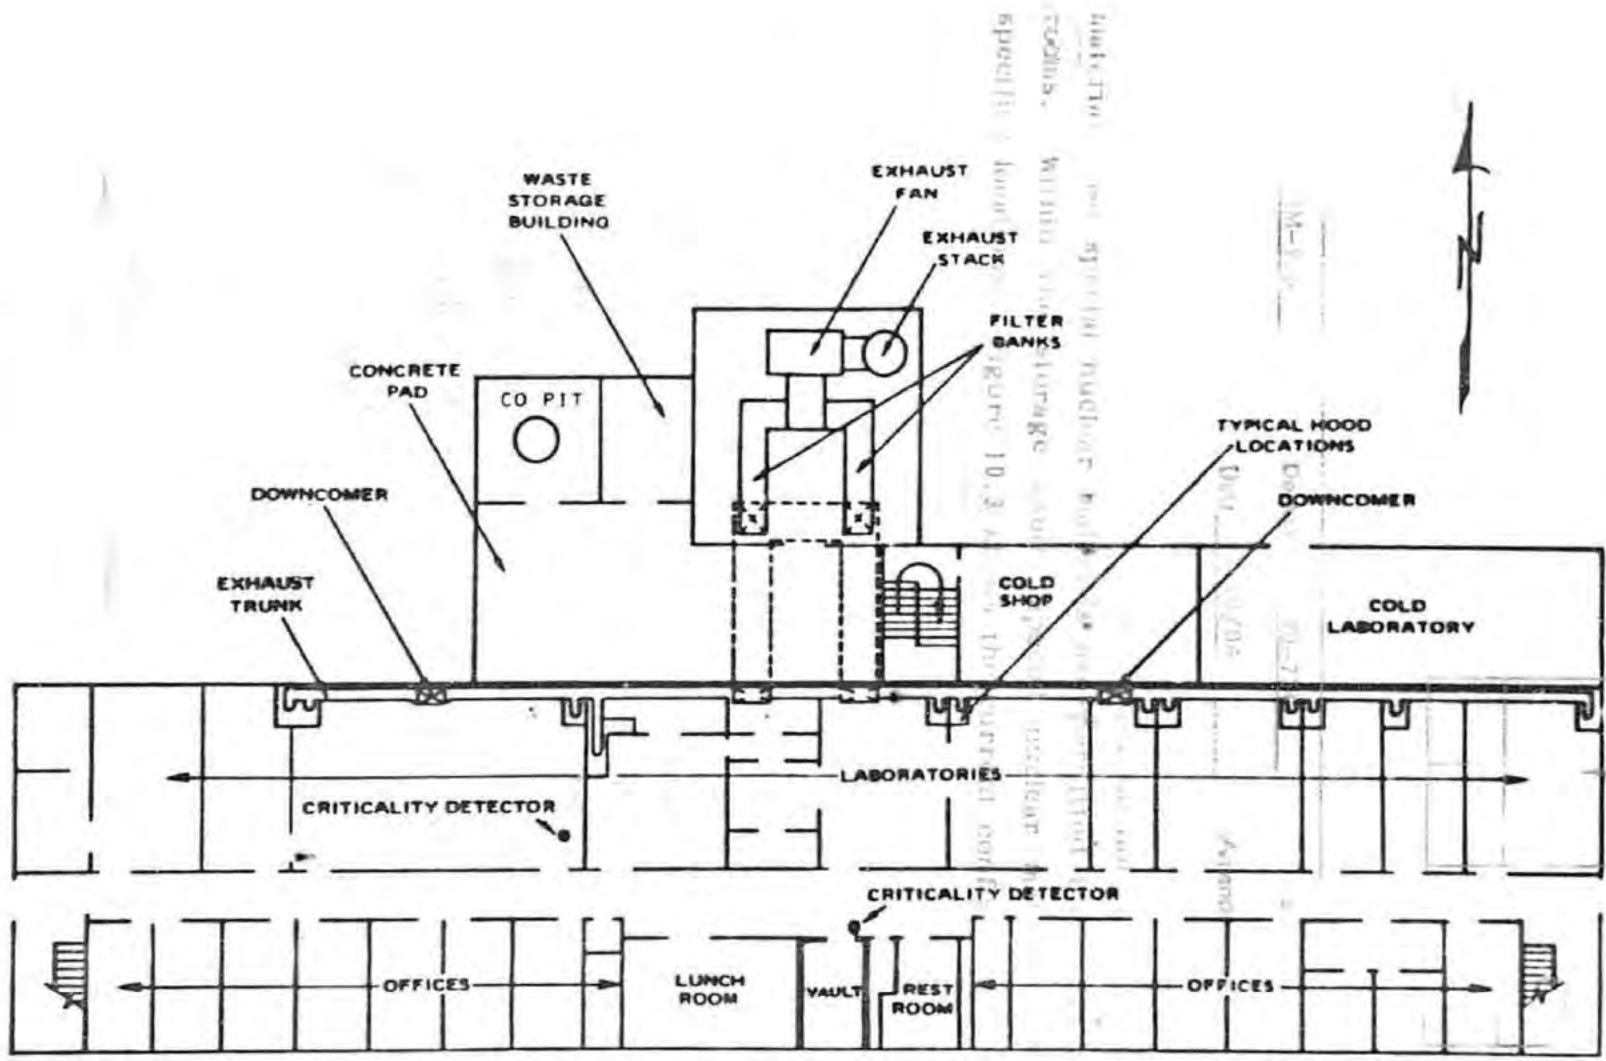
BUILDING 103 FLOOR PLAN (Ground Level)
